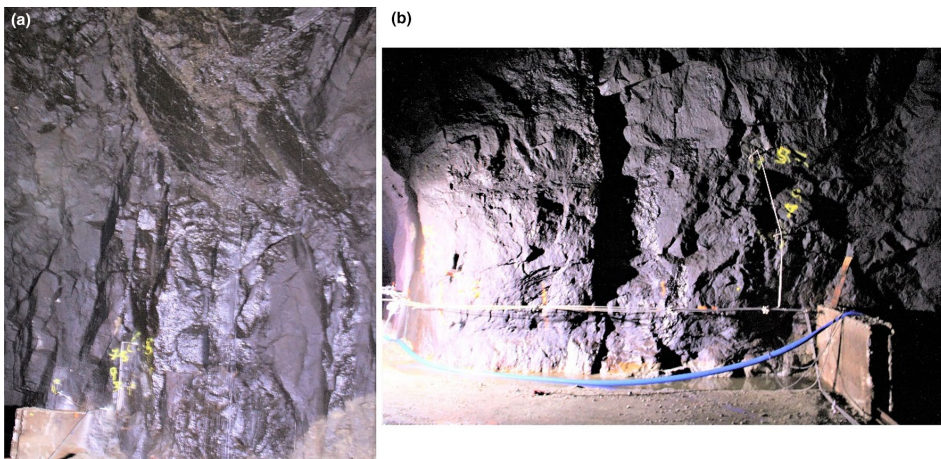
Joint conditions at a left wall (cross-joint J2 is visible) and b right wall showing  $J_{f\text{conductive}}$
